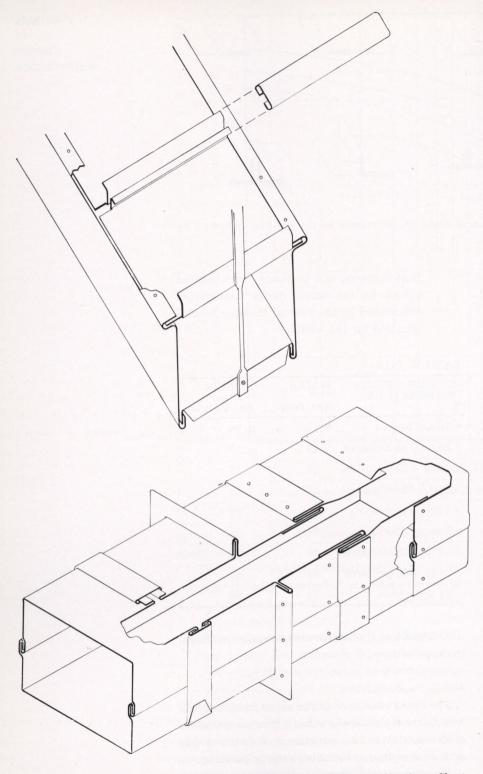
Duct constructions details; continued on Page 329. (From "Aluminum Sheet Metal Practice in the Building Industry" by Aluminium Company of Canada, Ltd.)
